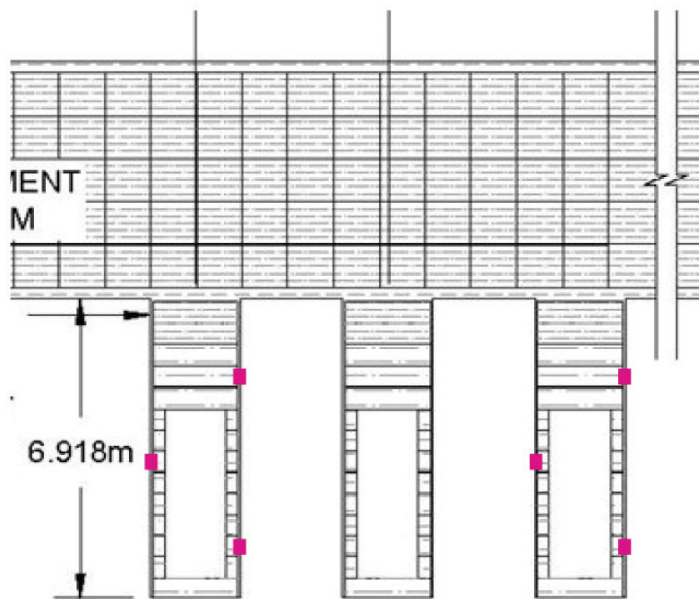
Longitudinal section of a container placement room showing the proposed location of total pressure sensors for EB System A
